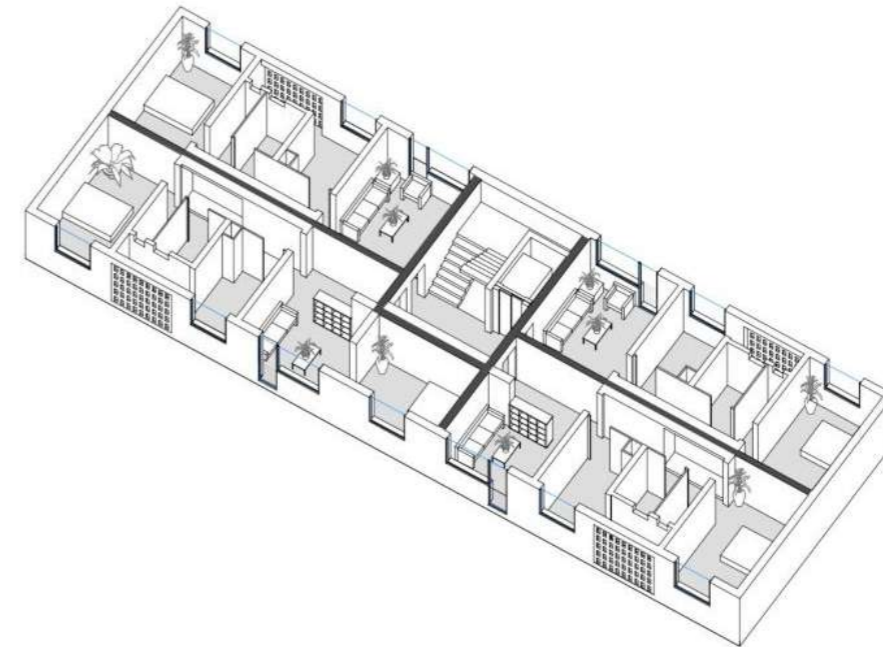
Existing Conditions, building G typical Floor Plan. © Lacaton&Vassal.
